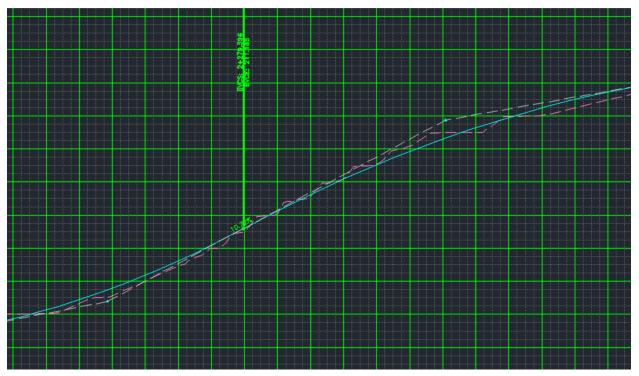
Street N.S.-1 Vertical Alignment West of Ritson Road
